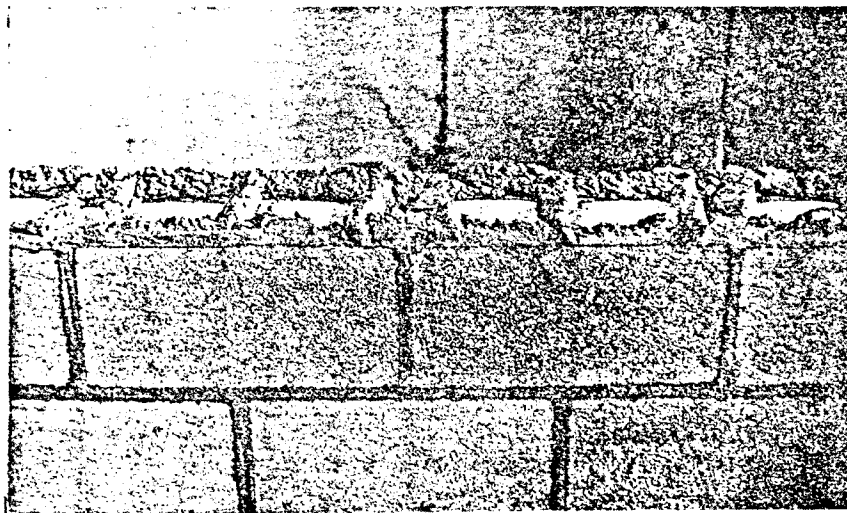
Shows typical mortar bedding used for all wall specimen construction.
